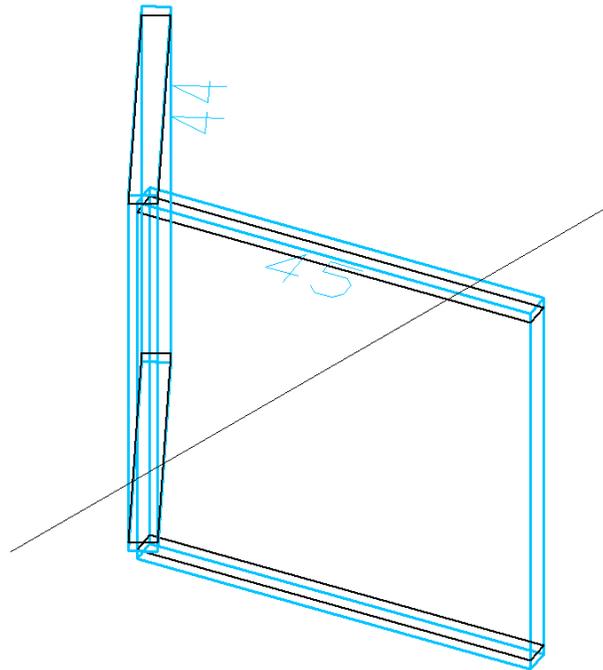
Wall Pier 1 - Design Sections at Level 7
